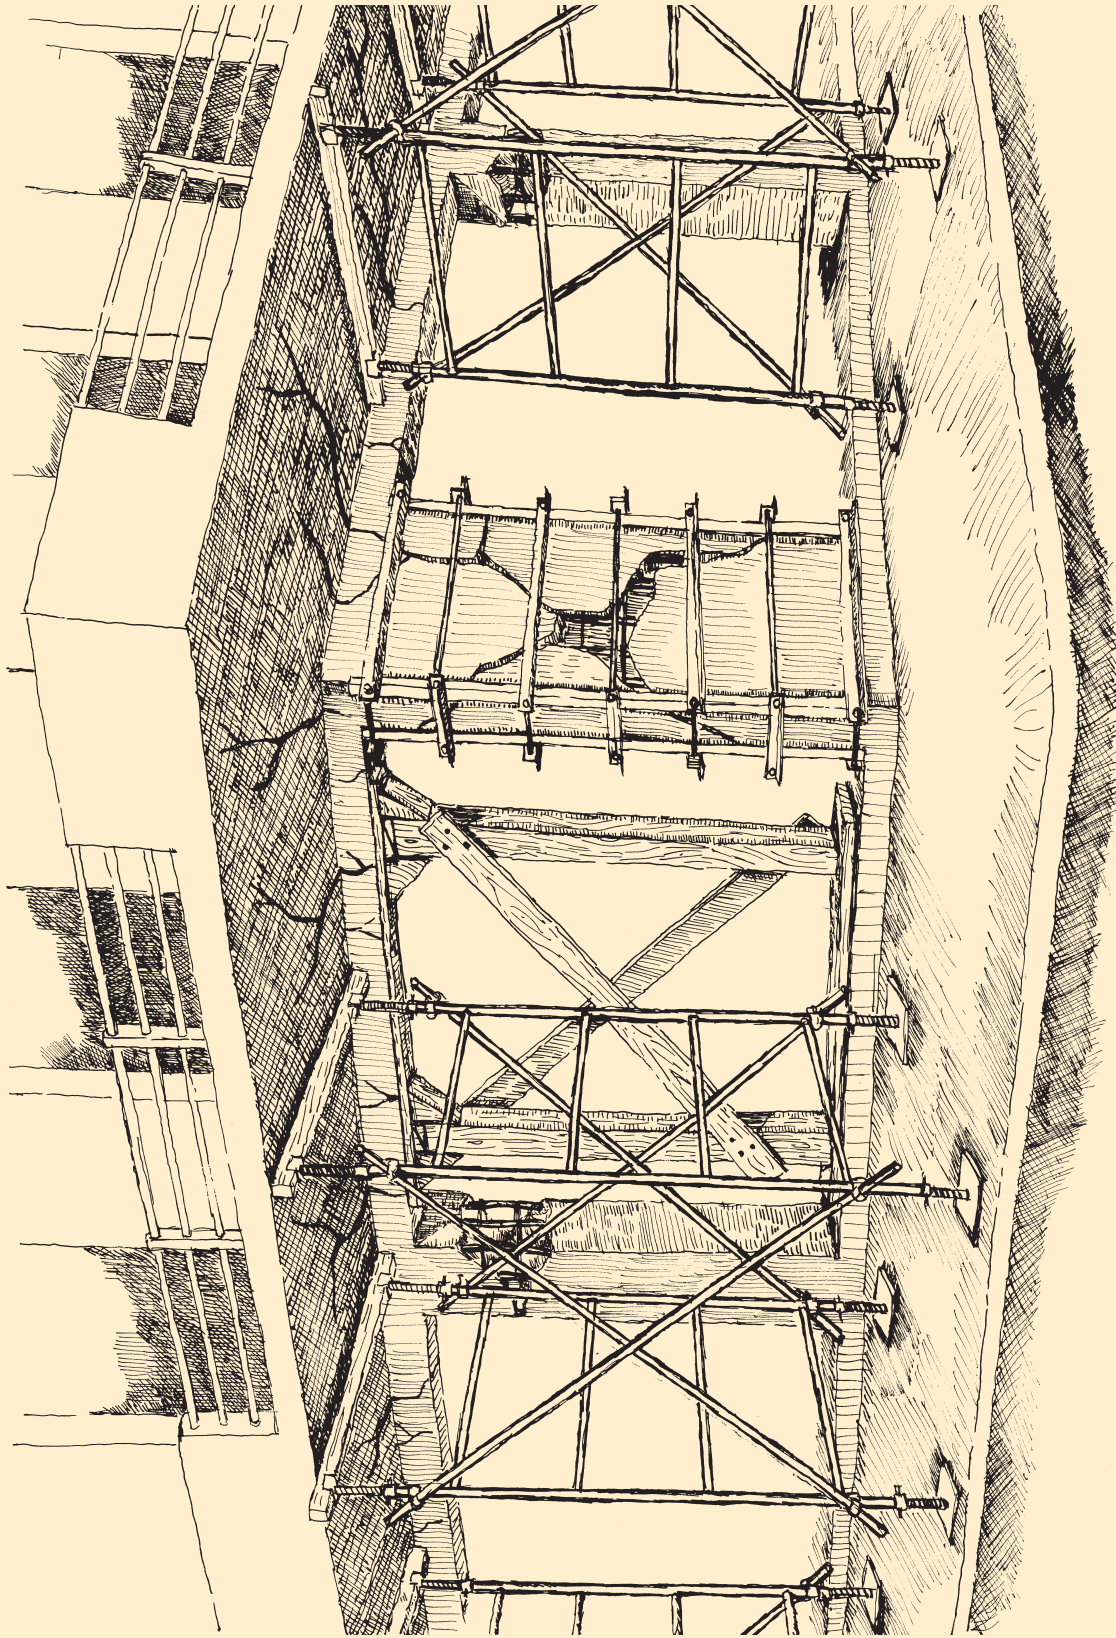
Combination of propping – shoring, on a corner building with extended damages on columns, beams and balconies.
